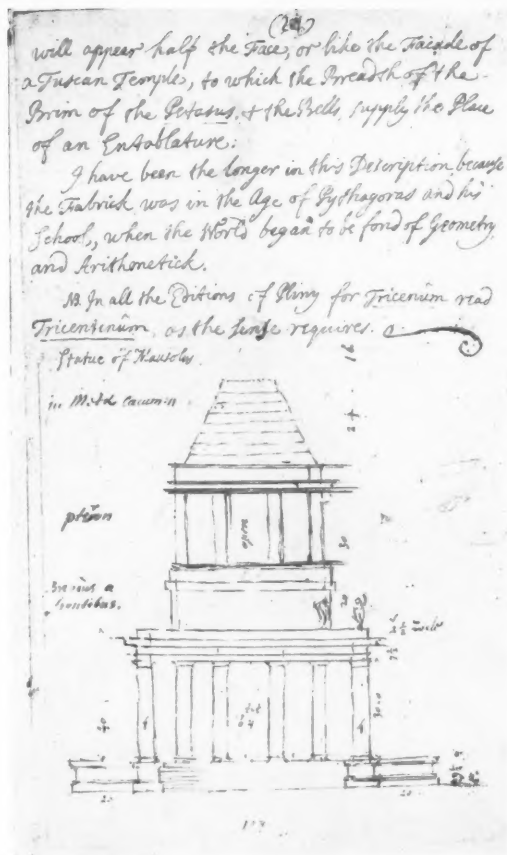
WREN'S SKETCH ELEVATION OF THE MAUSOLEUM.
